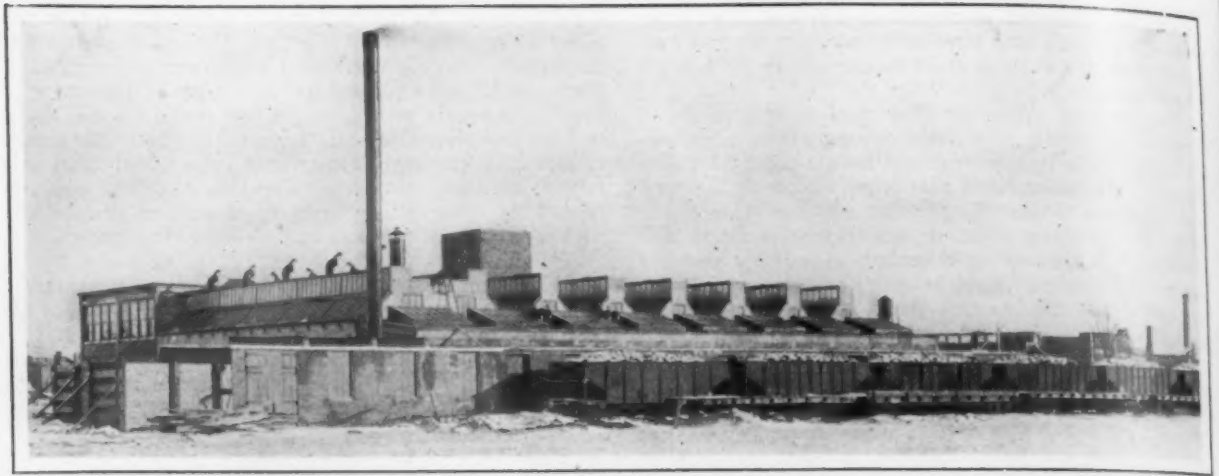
Exterior View of the Foundry Building Showing an Interesting Type of Roof in which Saw-tooth and Monitor Roof are Combined
